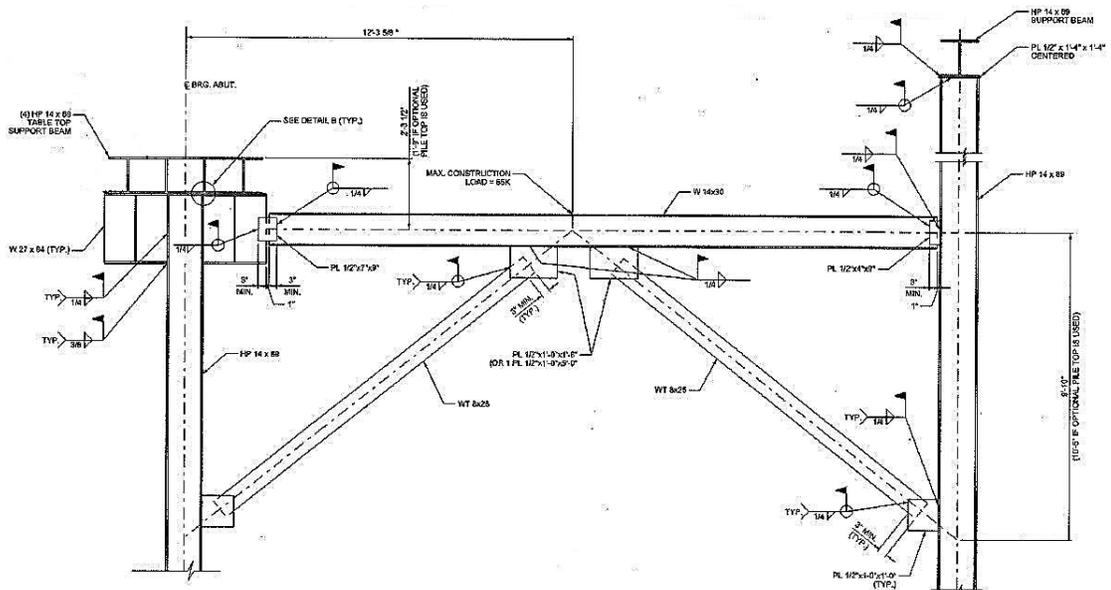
End view of the I-80 at Wanship WB and EB bridge temporary substructure at the abutment and the end of approach with lateral bracing
